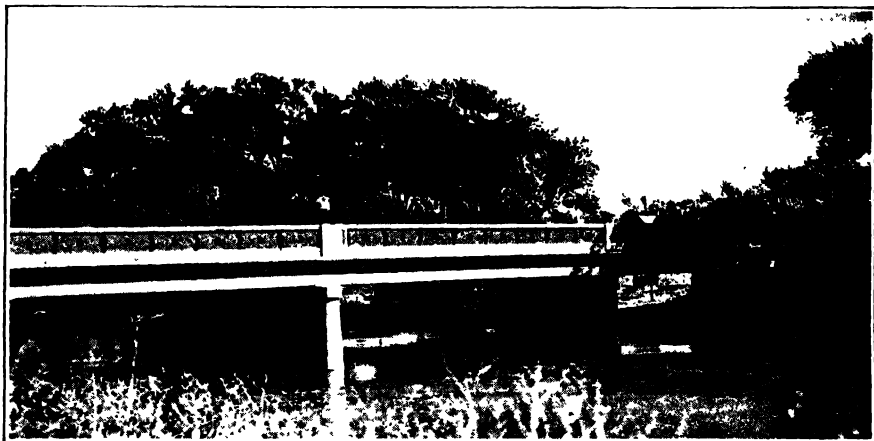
Deck girder bridge built in 1921 over Little Calumet River, Cook County, Illinois—spans 45 ft. each—roadway 24 ft.
